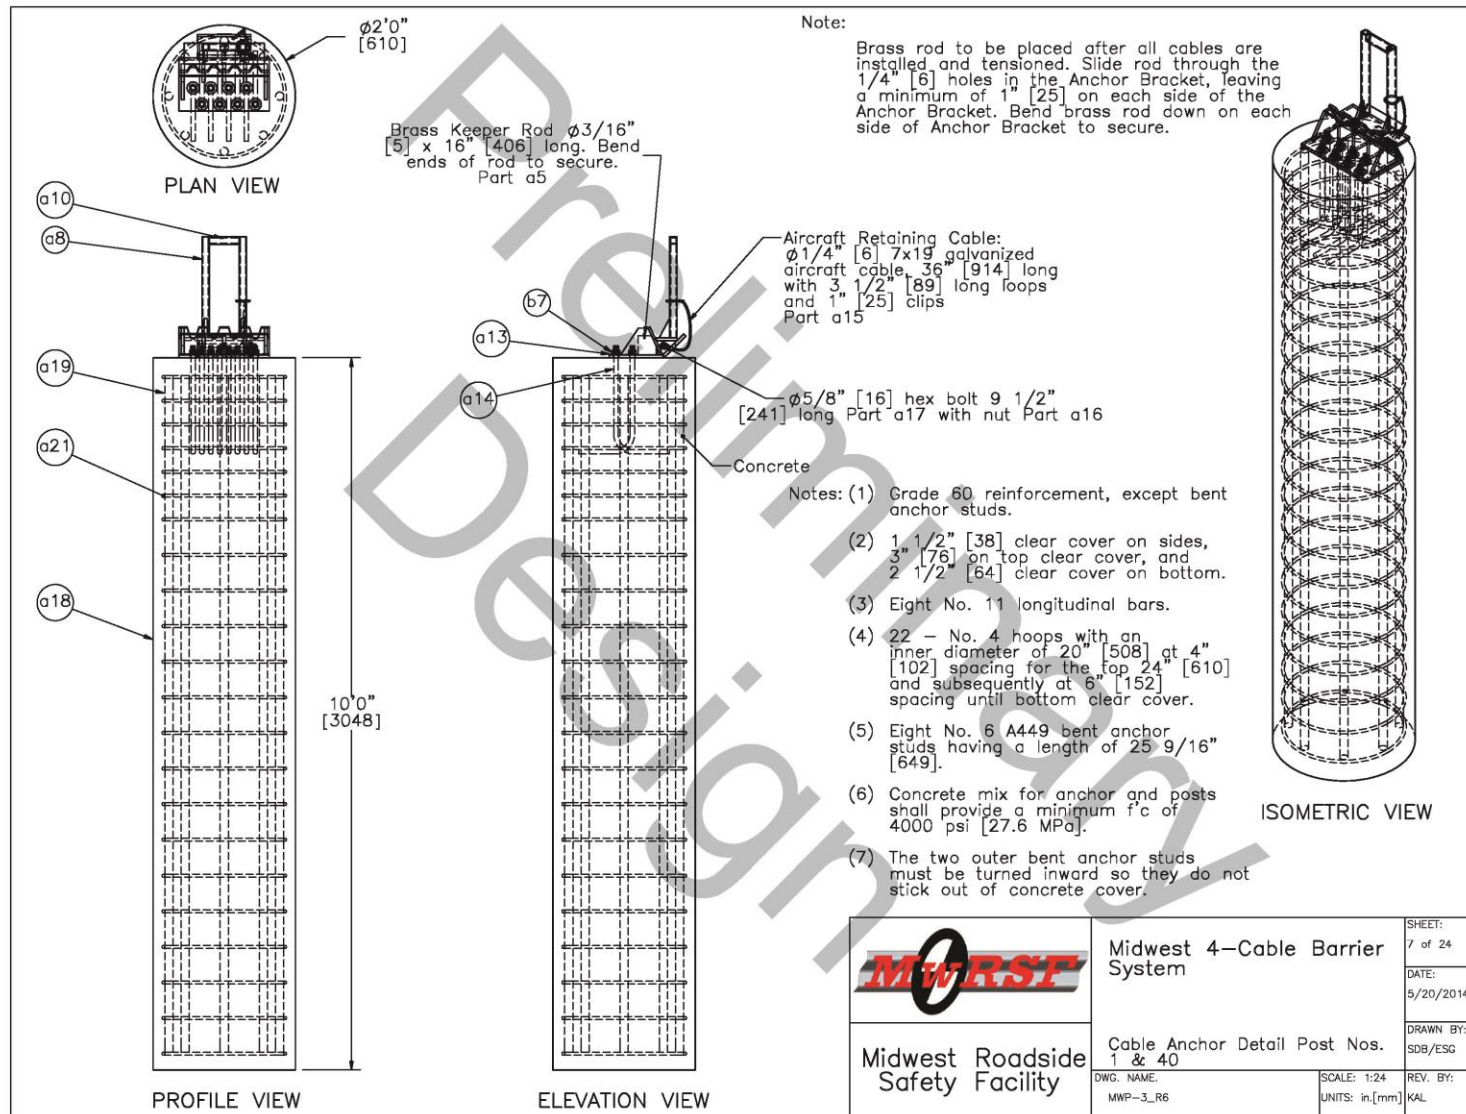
Cable Anchor Details, Post Nos. 1 and 40, Test No. MWP-3
